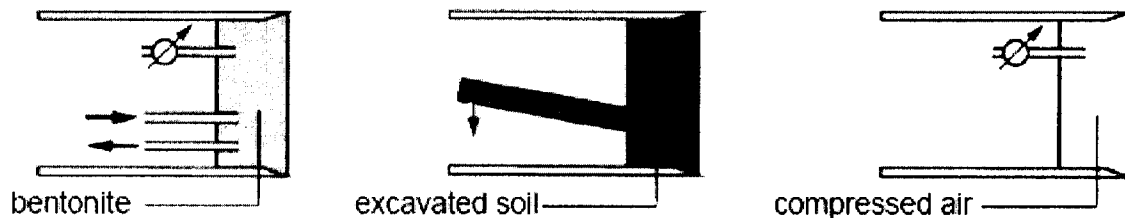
Face support by closed face tunneling a) Slurry (slurry shield) b) Excavated soil (EPB shield) c) Compressed air (Kovári and Ramoni, 2006)
